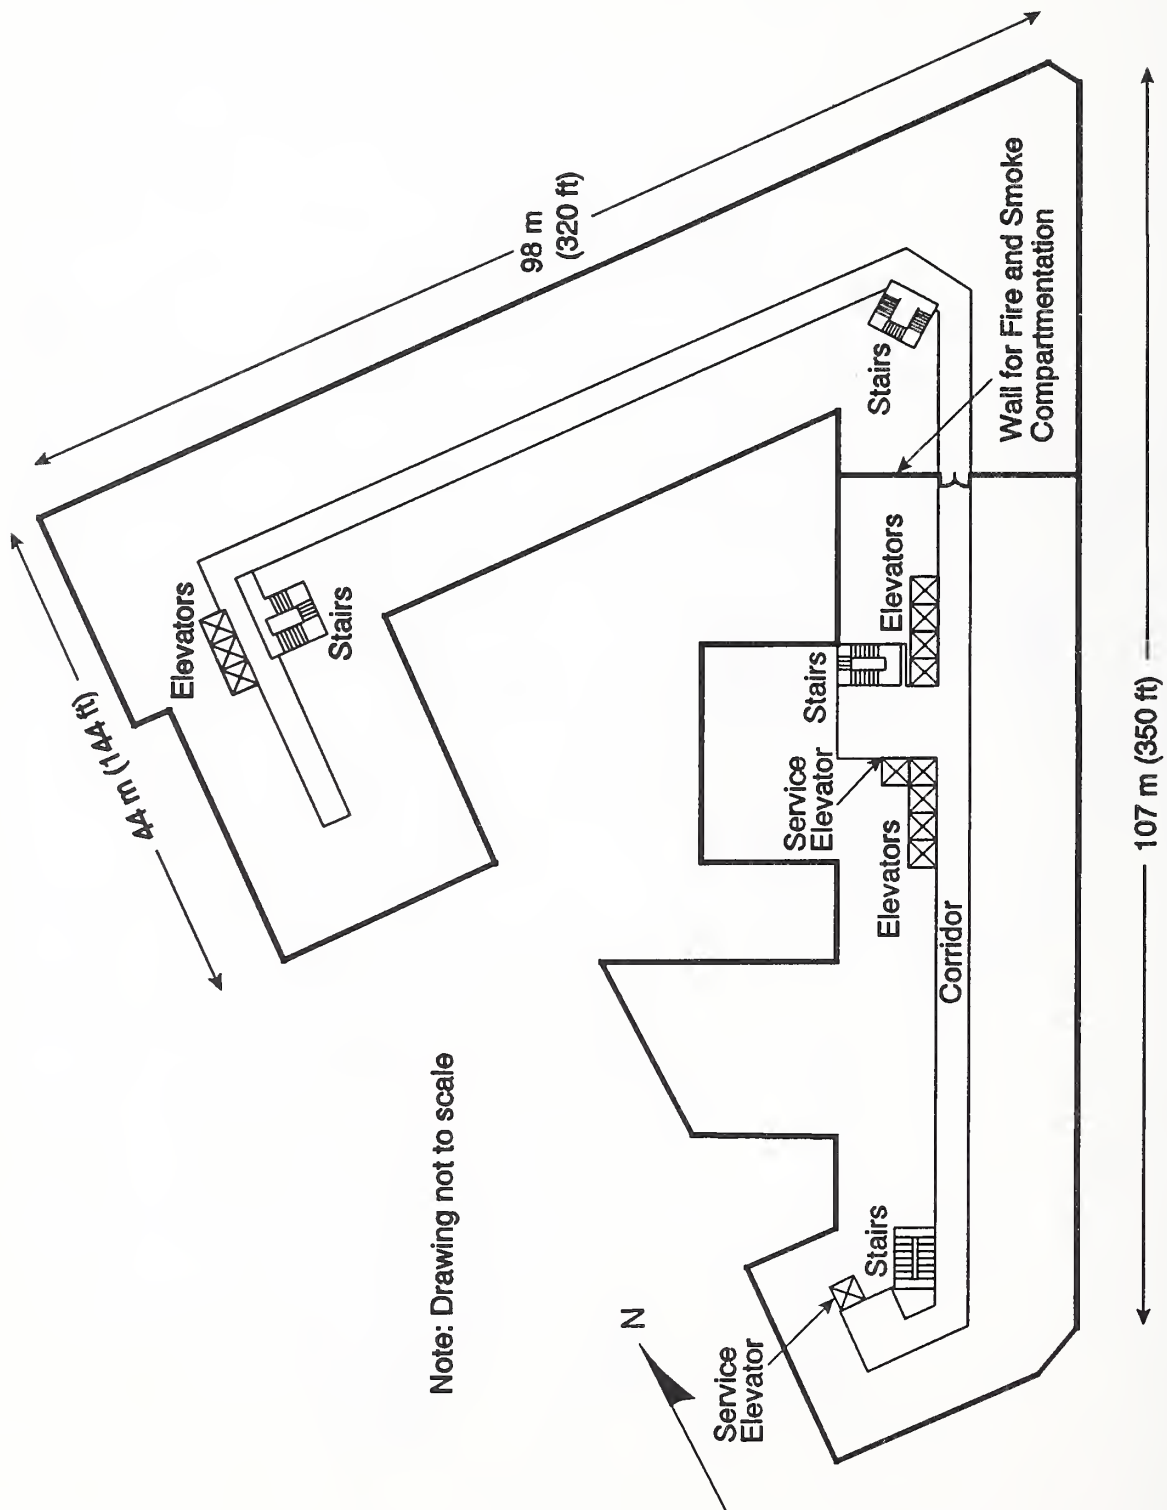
Typical plan of floors 2 through 11 of the Department of Veterans Affairs Building
